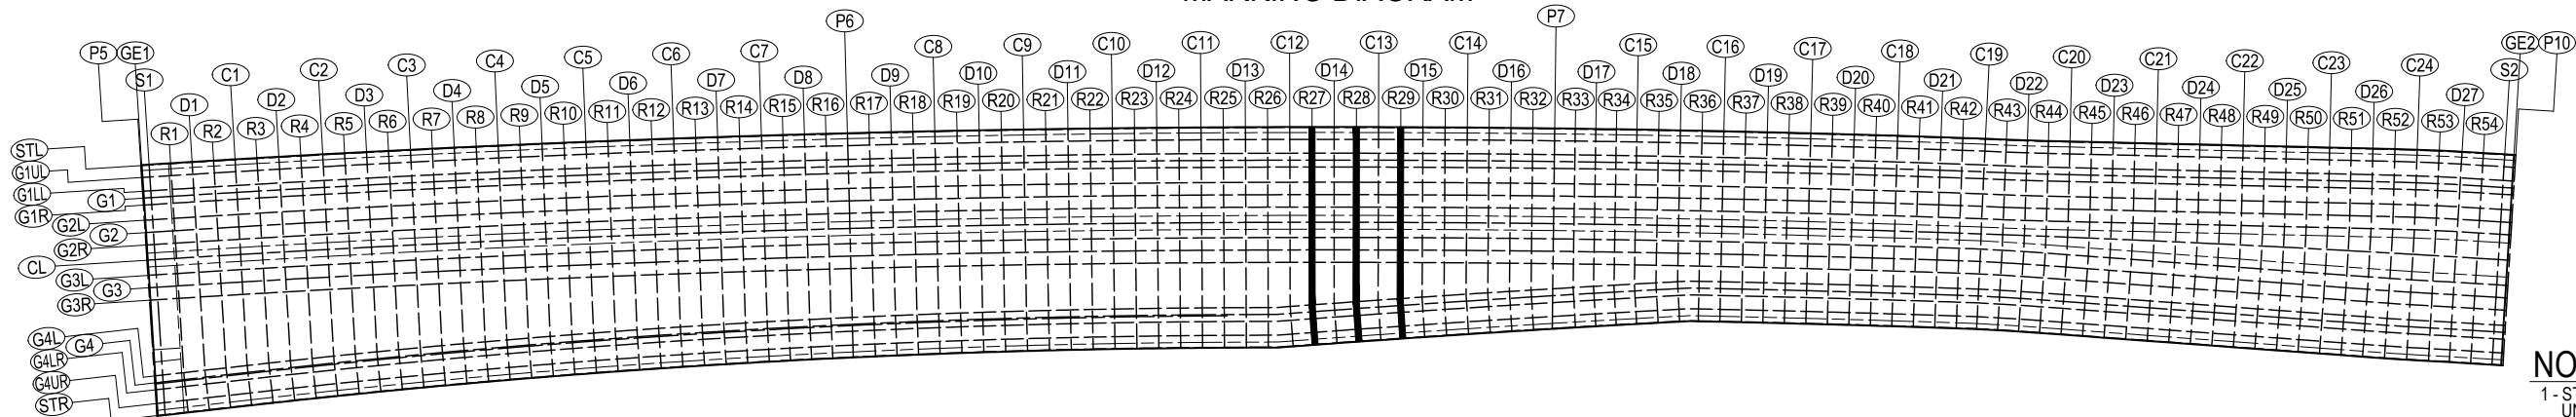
DETAIL OF CROSS BEAM SECTION (7) S=1:60 R27 TO R29 (1)
